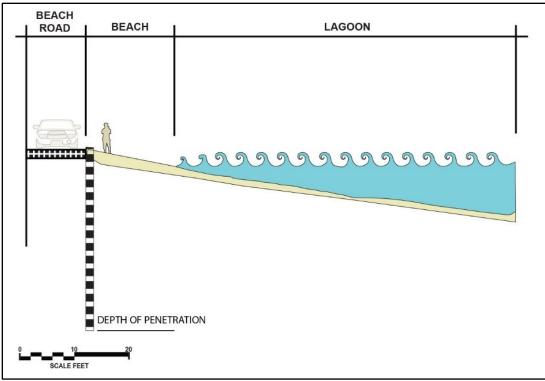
Steel sheet pile seawall designed to prevent undermining of Beach Road.
